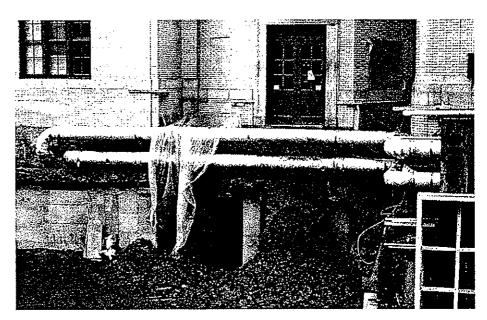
Concrete pier underpinning to an existing building may be necessary when adjacent construction occurs. In this example, pits are hand dug beneath the foundation of the historic building to provide space for wood forms. After concrete is poured into the forms, the space between the top of the pier and the bottom of the original foundation is packed with a quicksetting grout. The historic building owner should retain an independent engineer to ensure that the underpinning plan adequately protects the historic structure. Photo: Professor Arpad Horvath, Department of Civil and Environmental Engineering, University of California, Berkeley.
